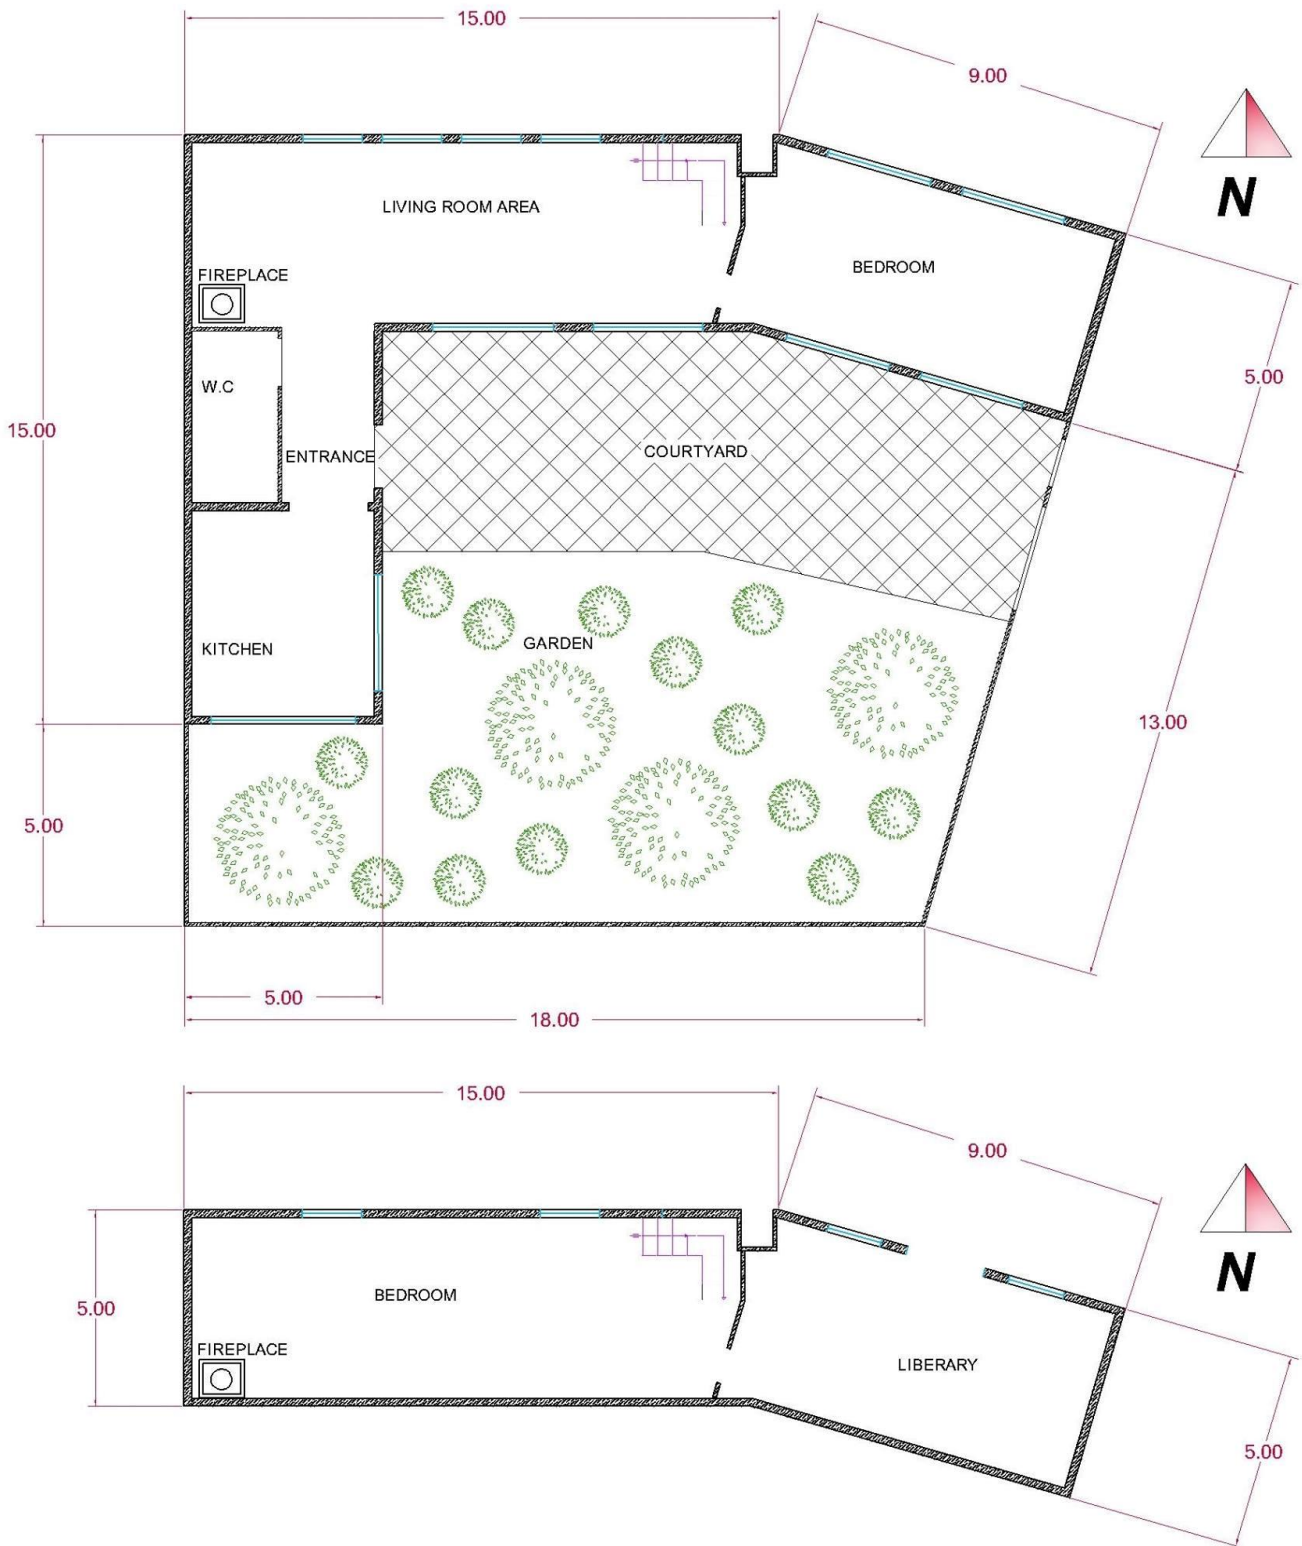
9 Ground floor and basement floor plan of House 1 (Movahedi, 2014)
